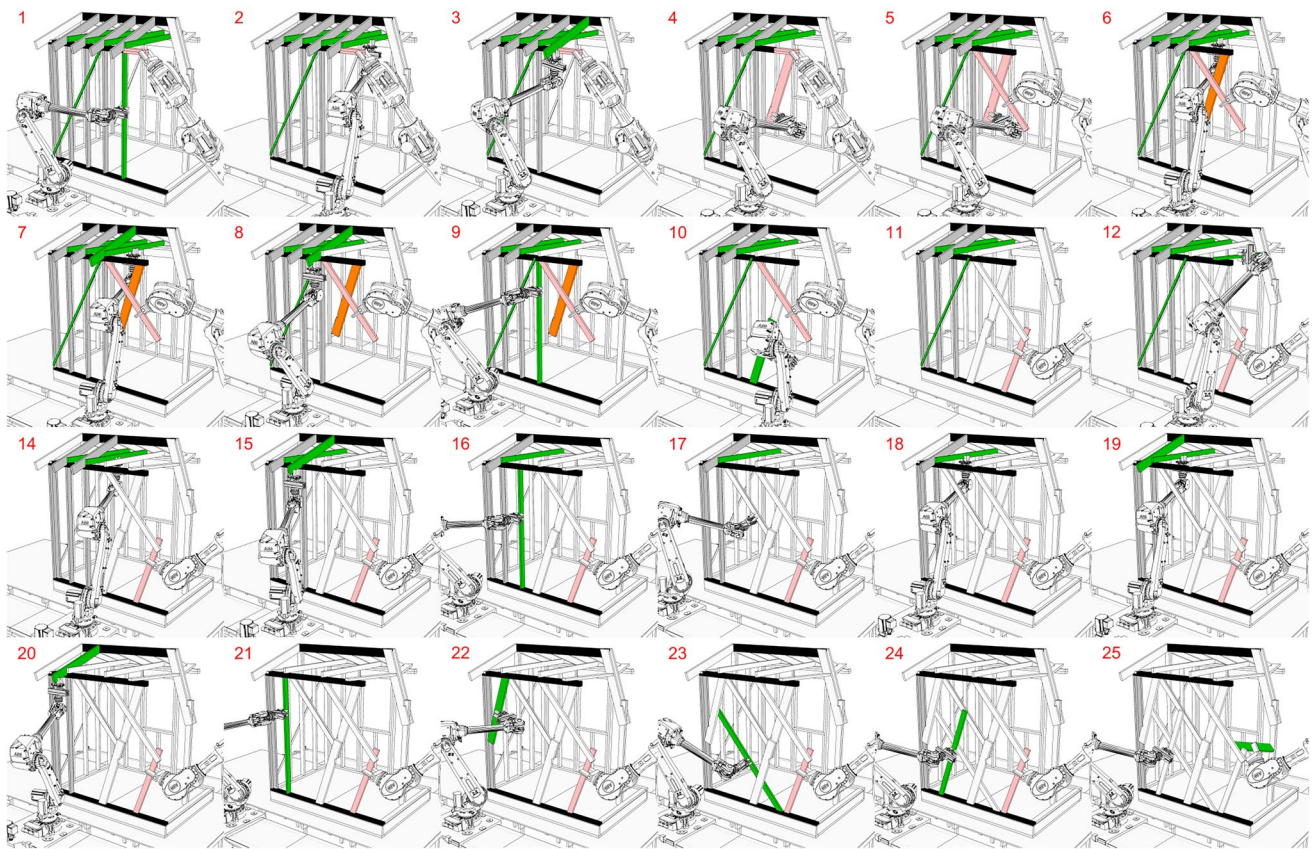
Phase 3 disassembly and full reassembly (each member removed is reused)
